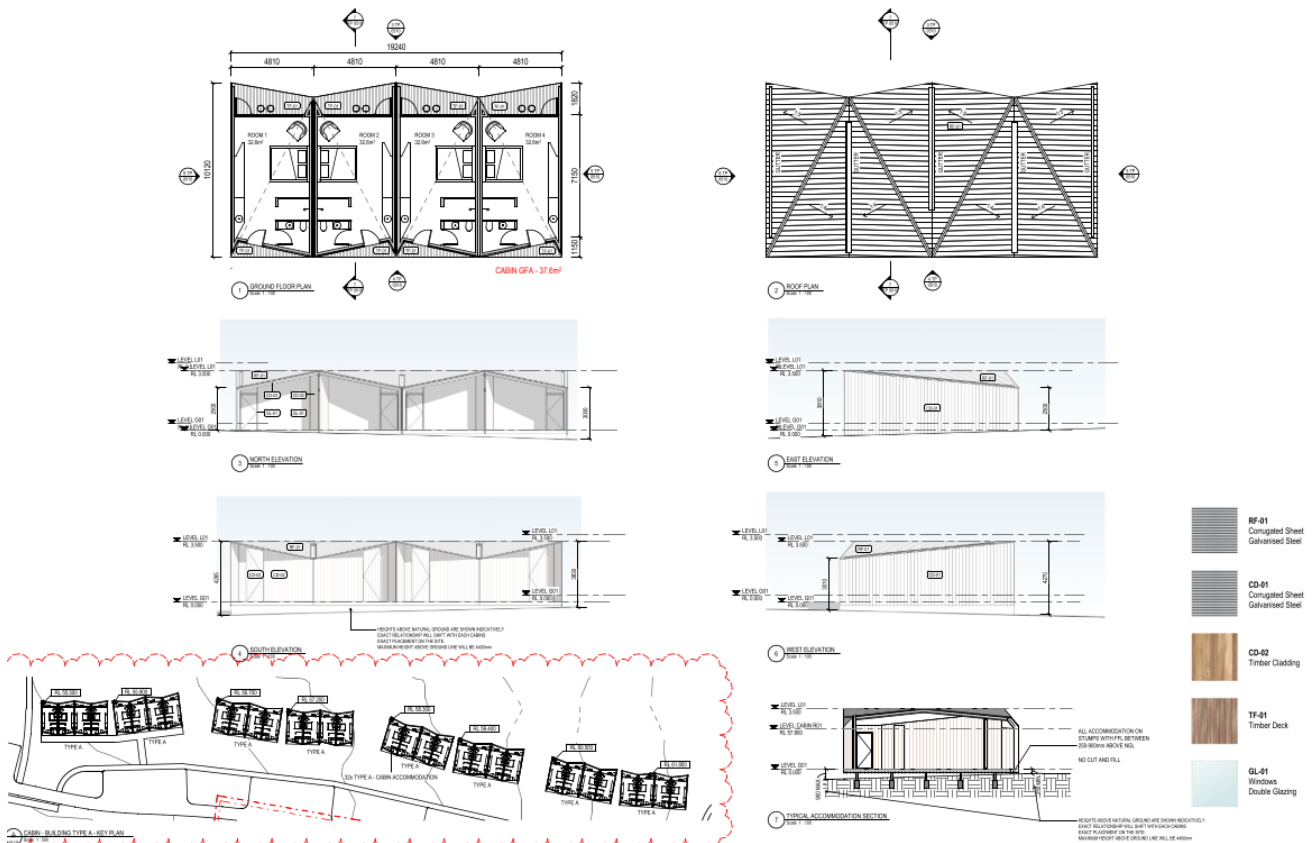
Group Accommodation typical floor plans, elevations and materials (Source: Wardle Architects)
